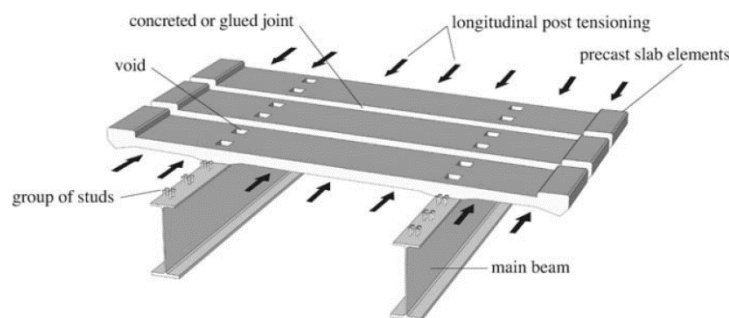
Slab construction by precasting principle (Lebet & Hirt, 2013)
